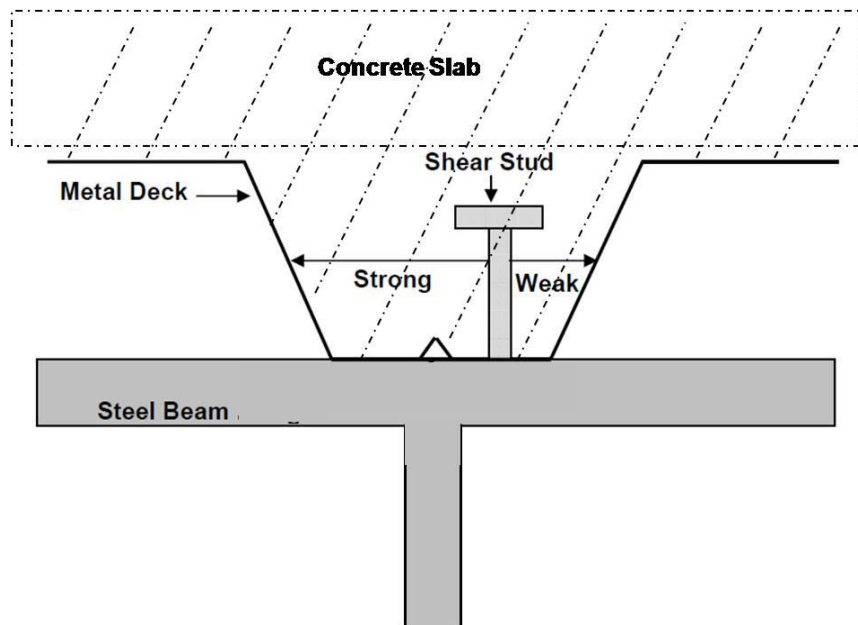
Shear stud connector in a composite floor system (McAllister *et al.* 2008).
